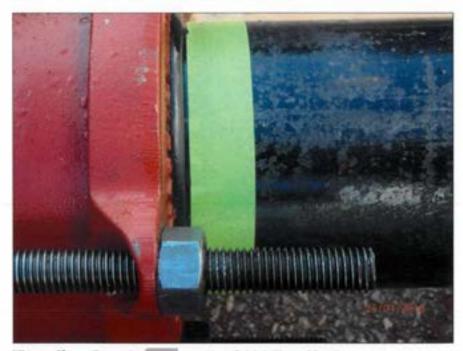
Exemplar coupling; Initial slip at 30 psi.
